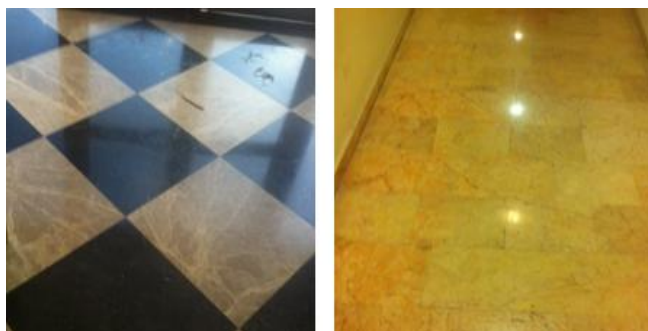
Common are flooring marbles and tiles at Metrokent
